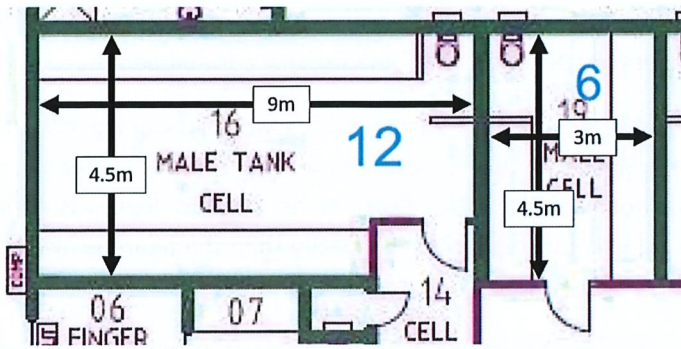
Layout of cell ‘MPCC’ in the Katherine Watch House and an example of a cell layout similar to ‘M1’. Floor plan provided by NT Police.
